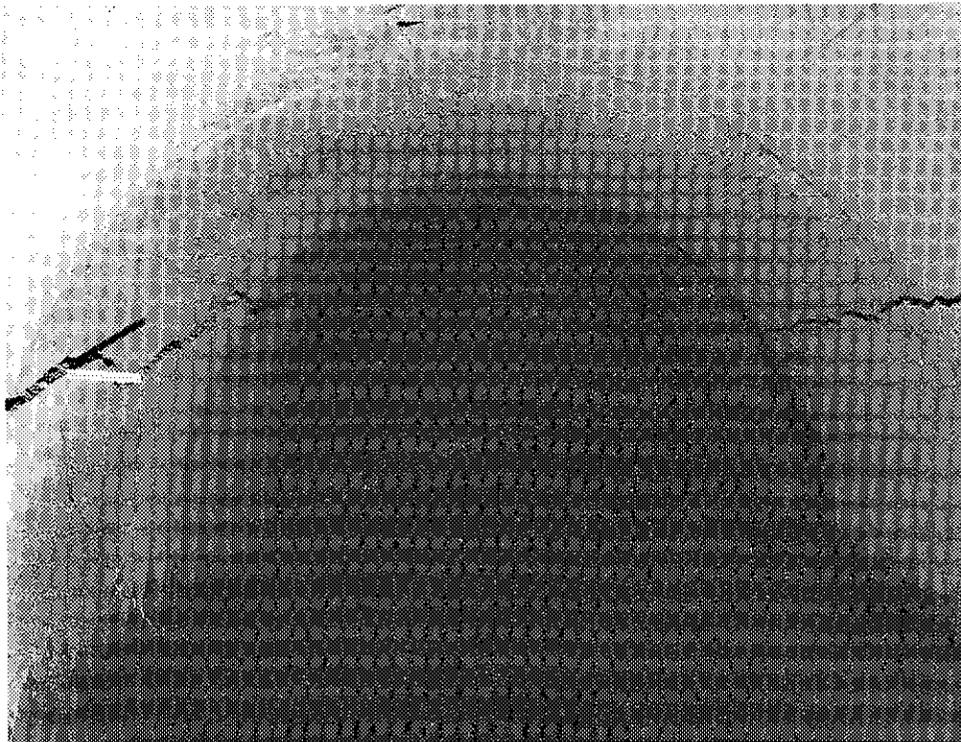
Typical longitudinal cracks in 84-inch concrete pipe.
